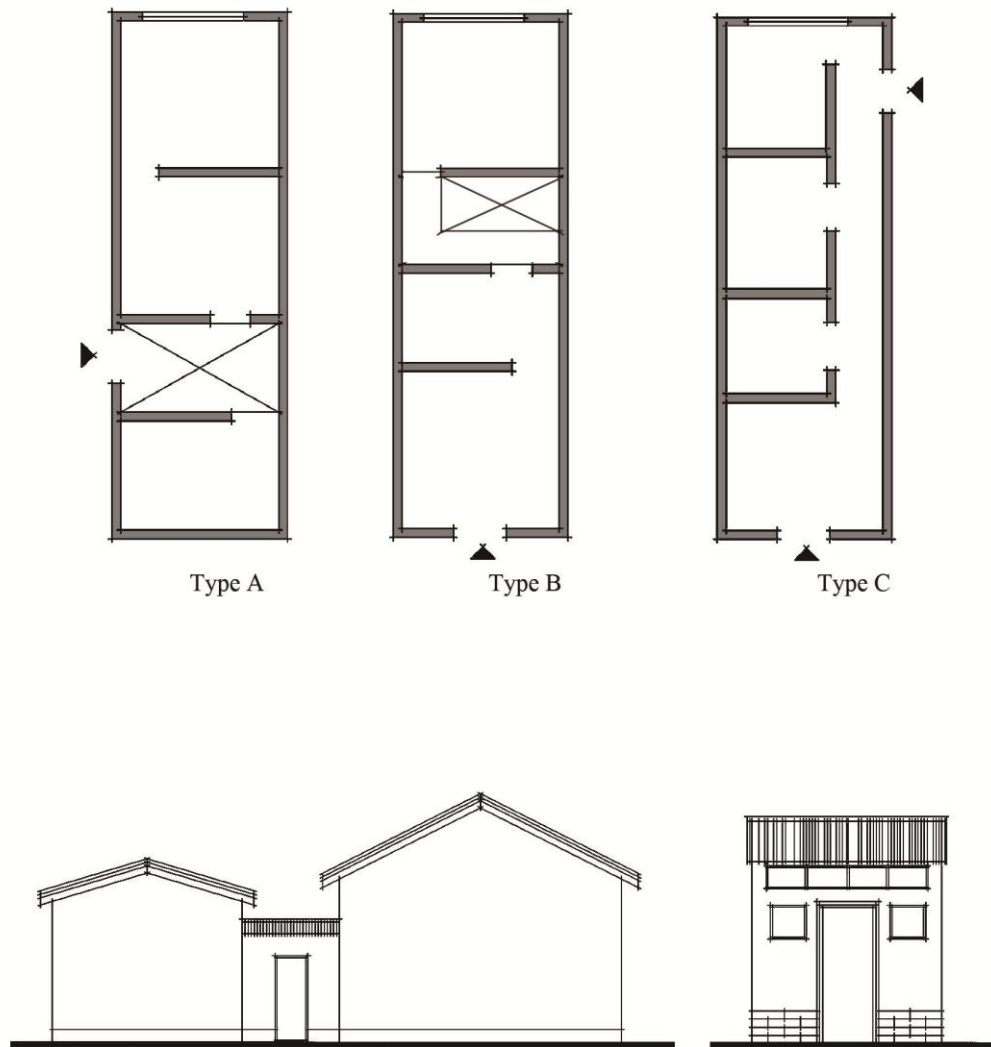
Floor plan and elevations of three types of *zhutongwu
